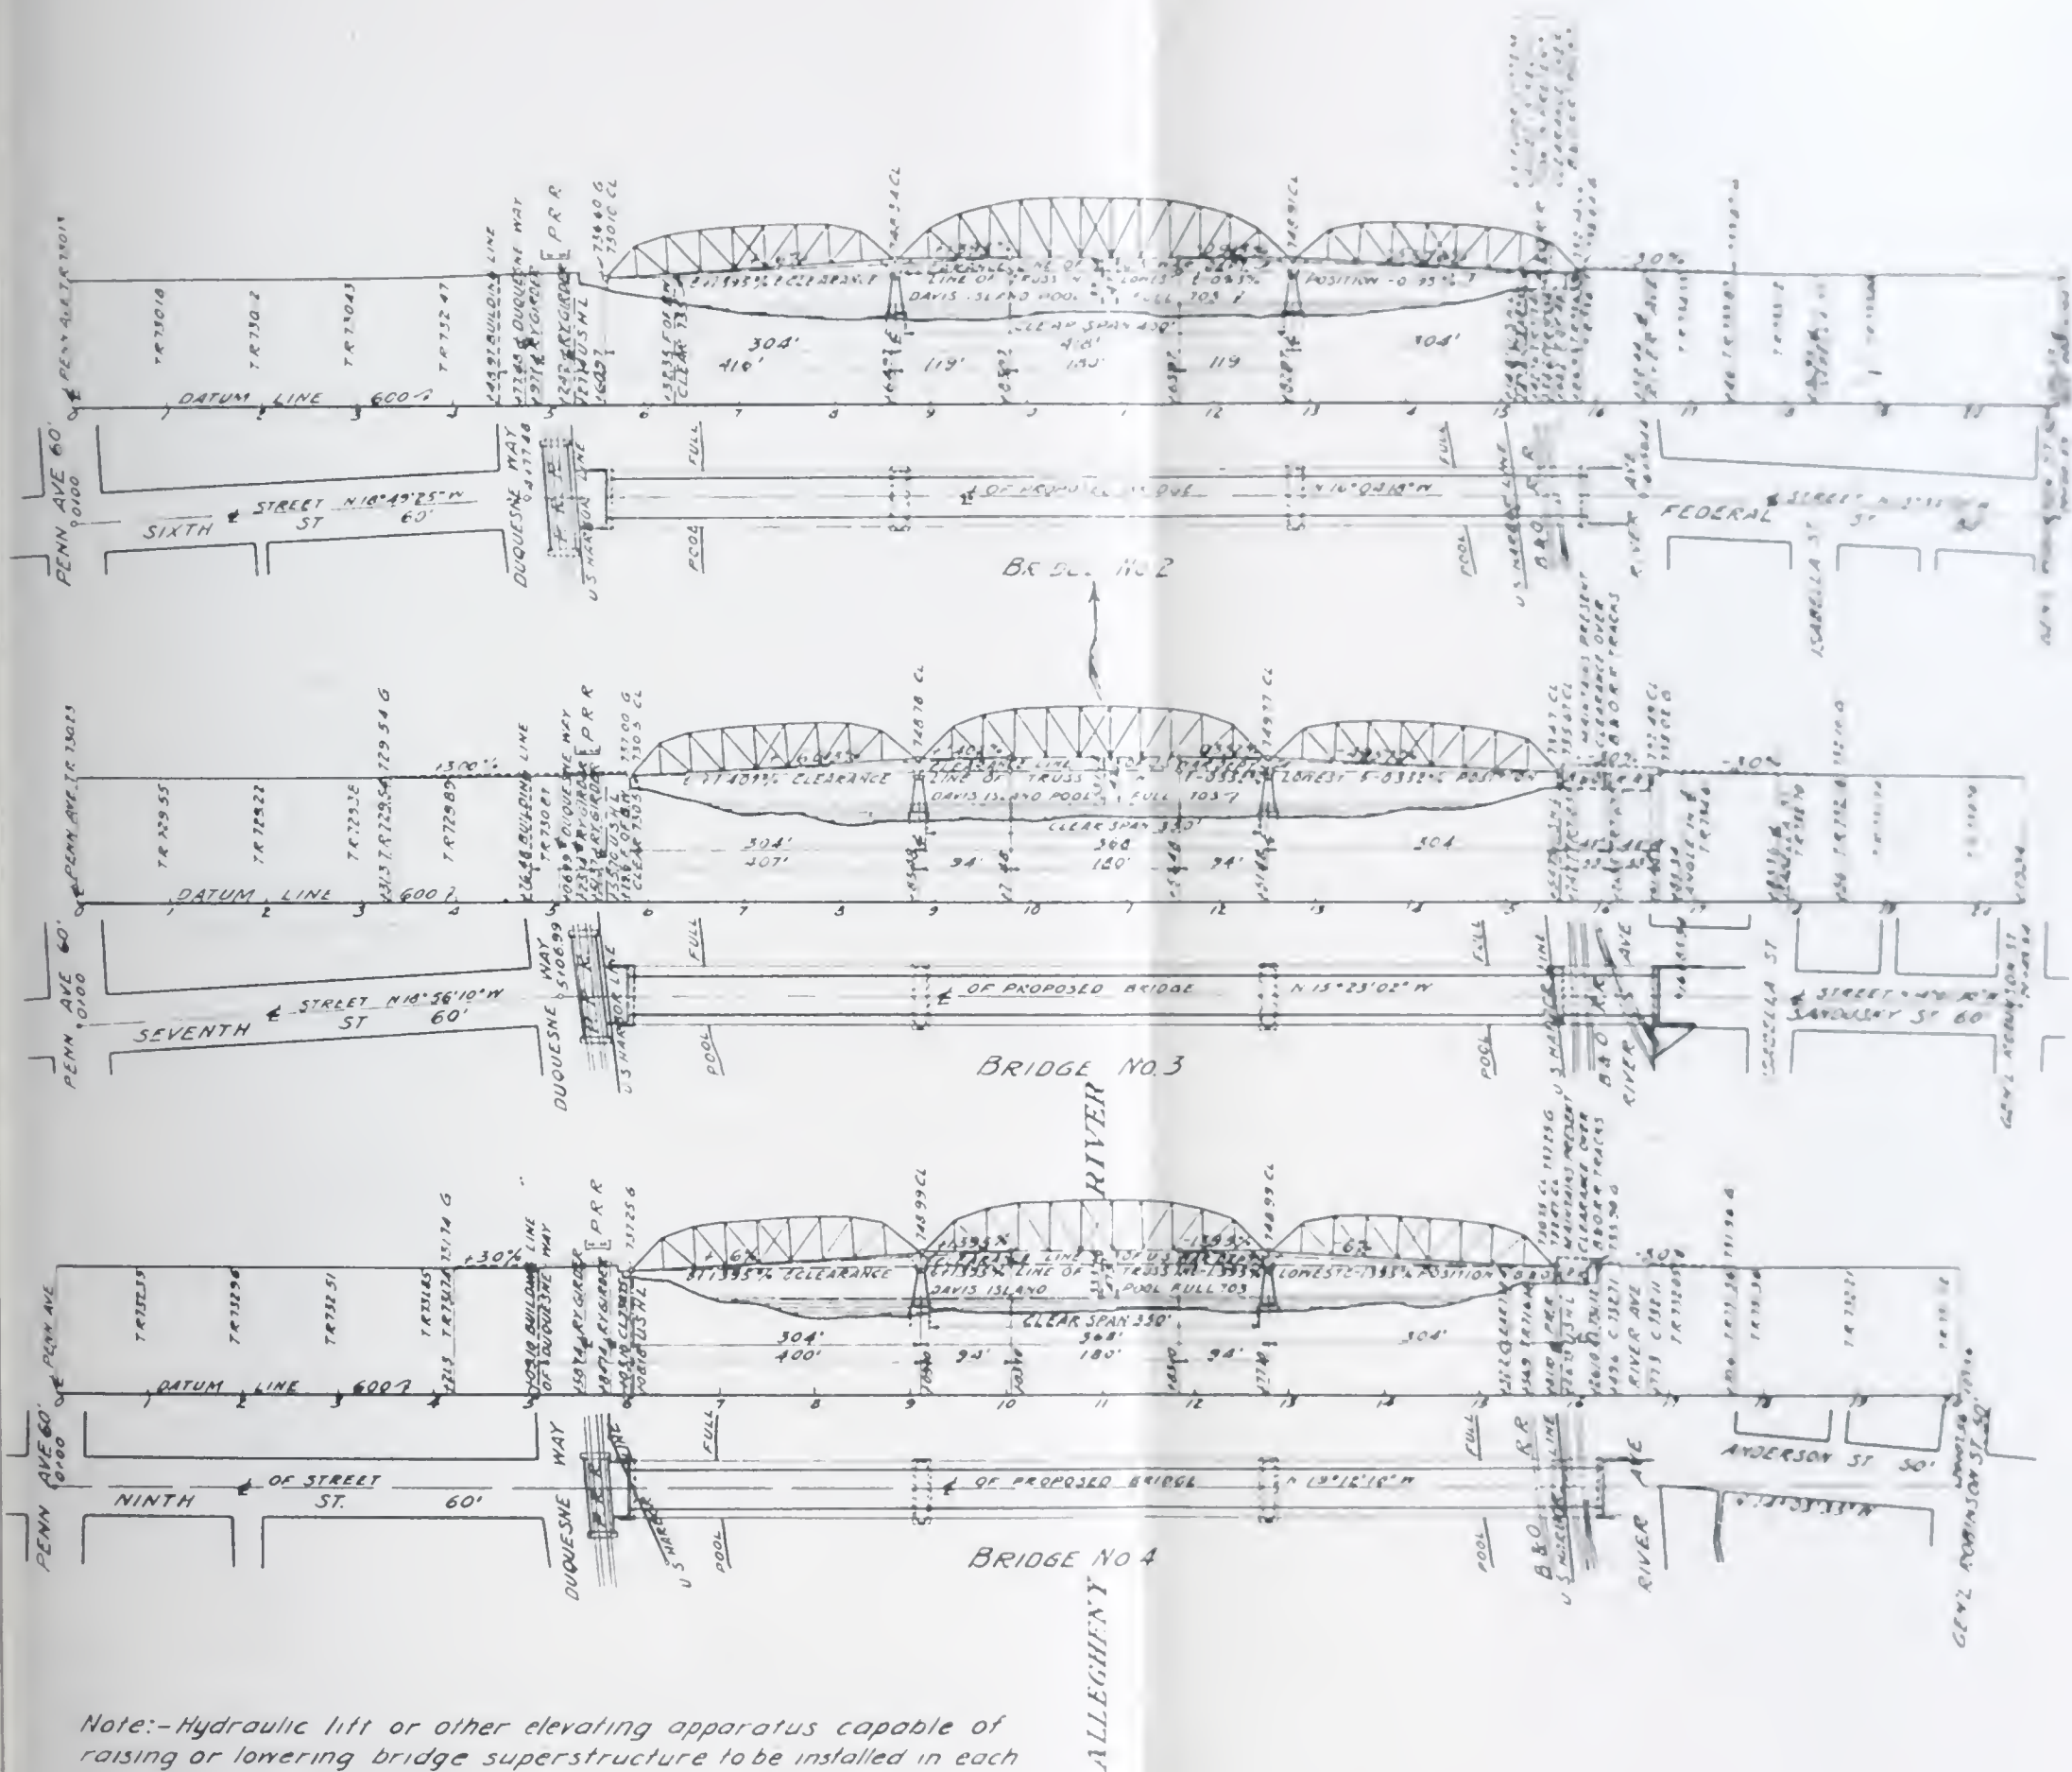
Profiles Illustrating Construction of Fixed Bridges.
